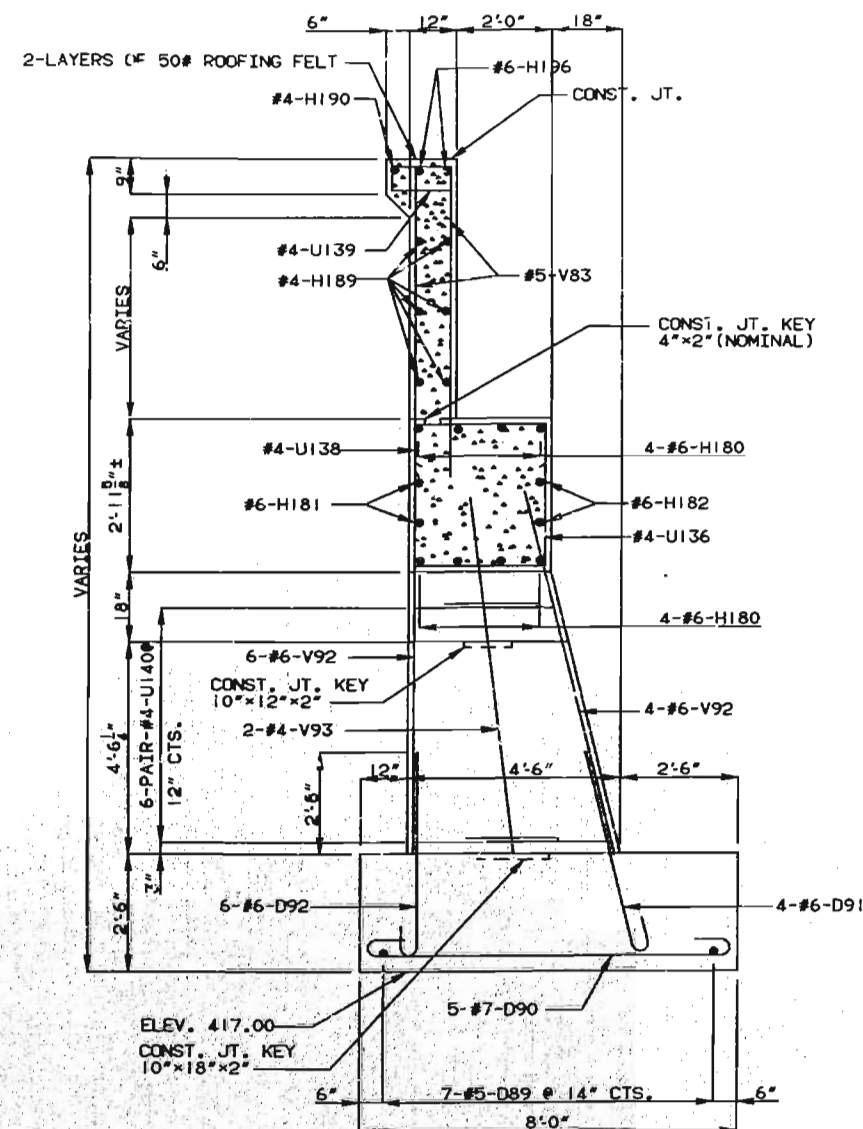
DETAILS OF END BT. NO. 16 (NORTHBOUND LANE)
